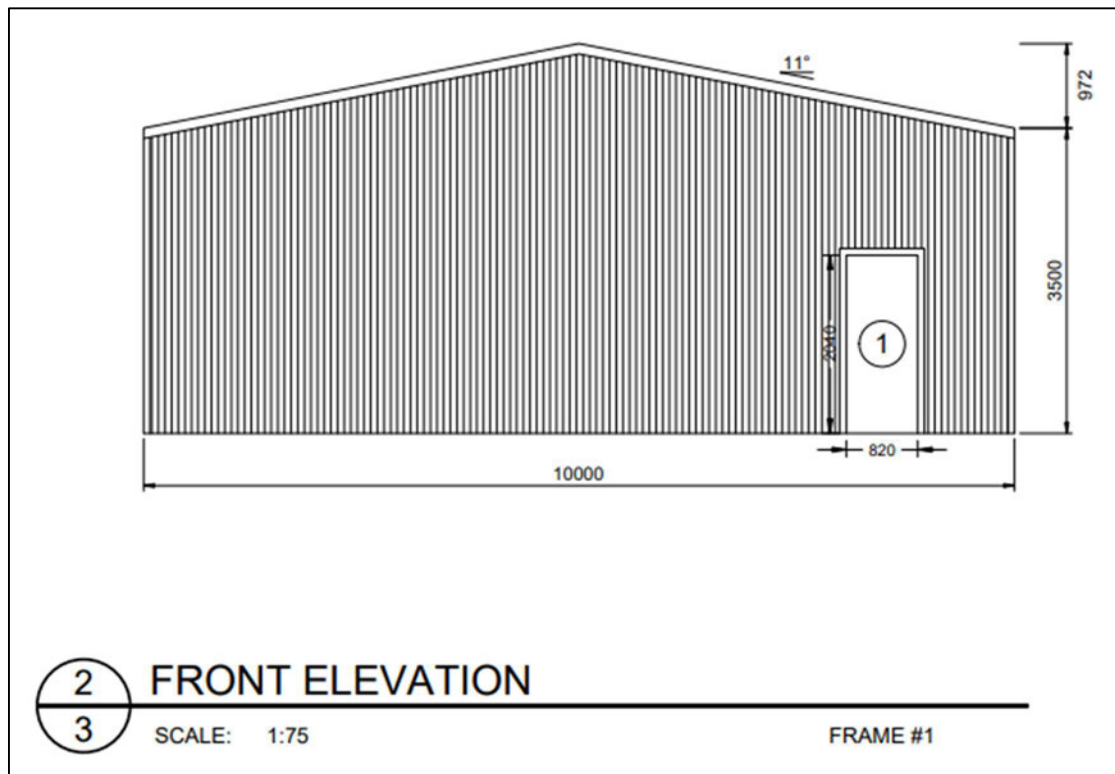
Front Elevation Frame #1 Prepared by Emerald Design and Construction (Appendix 2)
